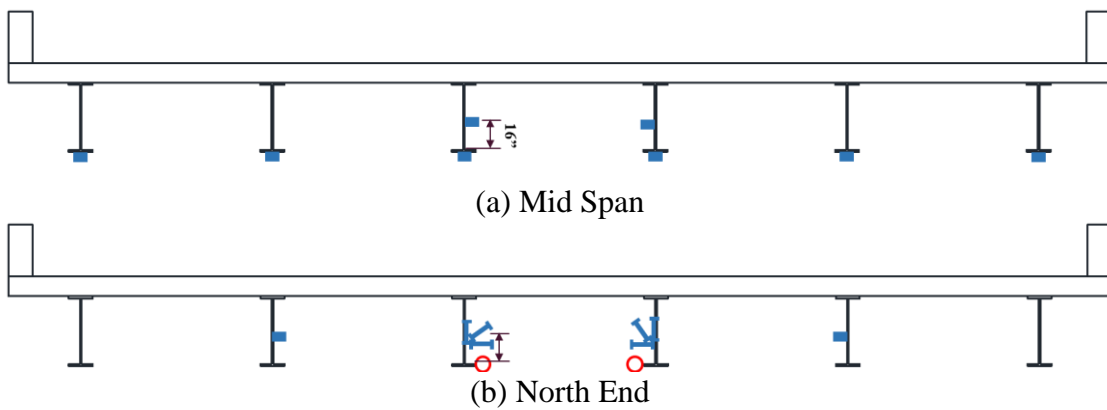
Sensor Layout for Bridge #3 (Cross Sections Looking South).
